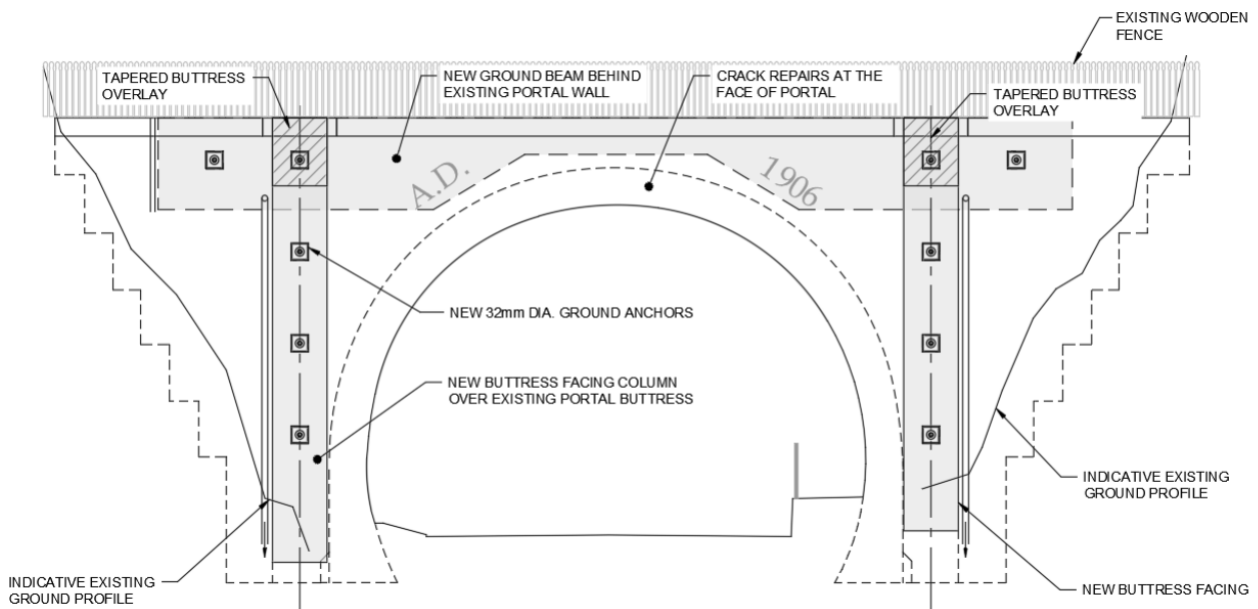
General layout of strengthening measures of Seatoun Tunnel portals
